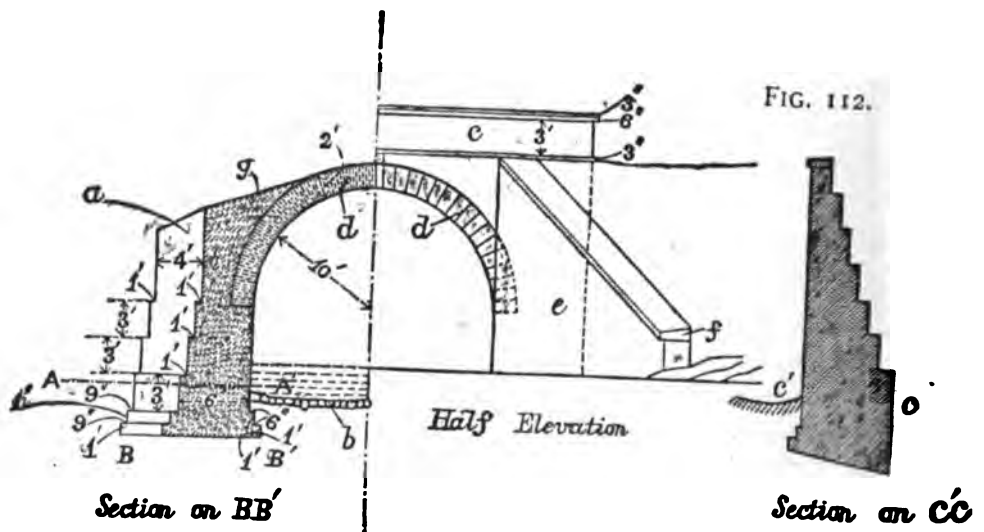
is a half-section, half-elevation of a good type of masonry bridge. The half-section is taken across BB (Fig. 111) and shows the abutment and arch-ring of the bridge only. The unshaded portion a is the elevation of the counterfort a of the sectional plan, Fig. 111. The foundations must be carried below the scouring action of the stream. The paving of the bridge is shown at b with the water of the stream above it.
